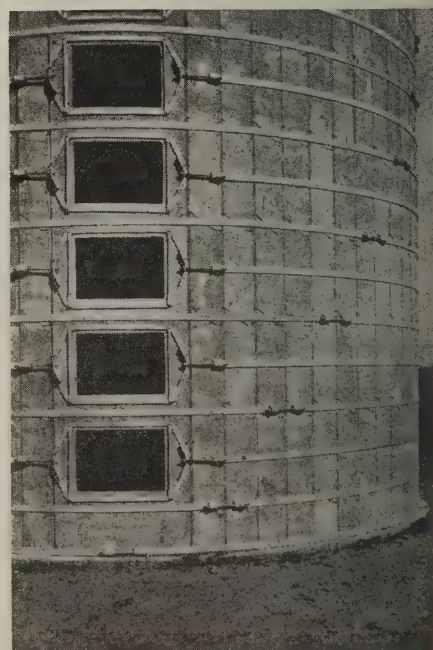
Detail showing "double hooping" and steel spreader frames at the door openings, in a large concrete stave silo
